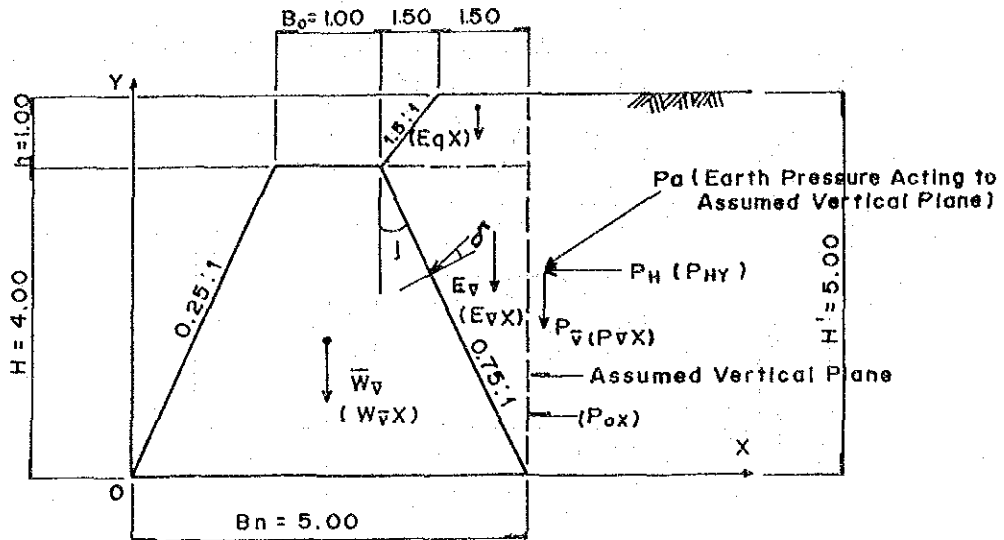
ILLUSTRATION OF GABION RETAINING WALL
